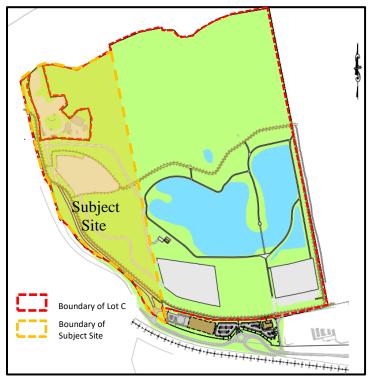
Site Development Plan proposed for Lots A, B, C, and D
